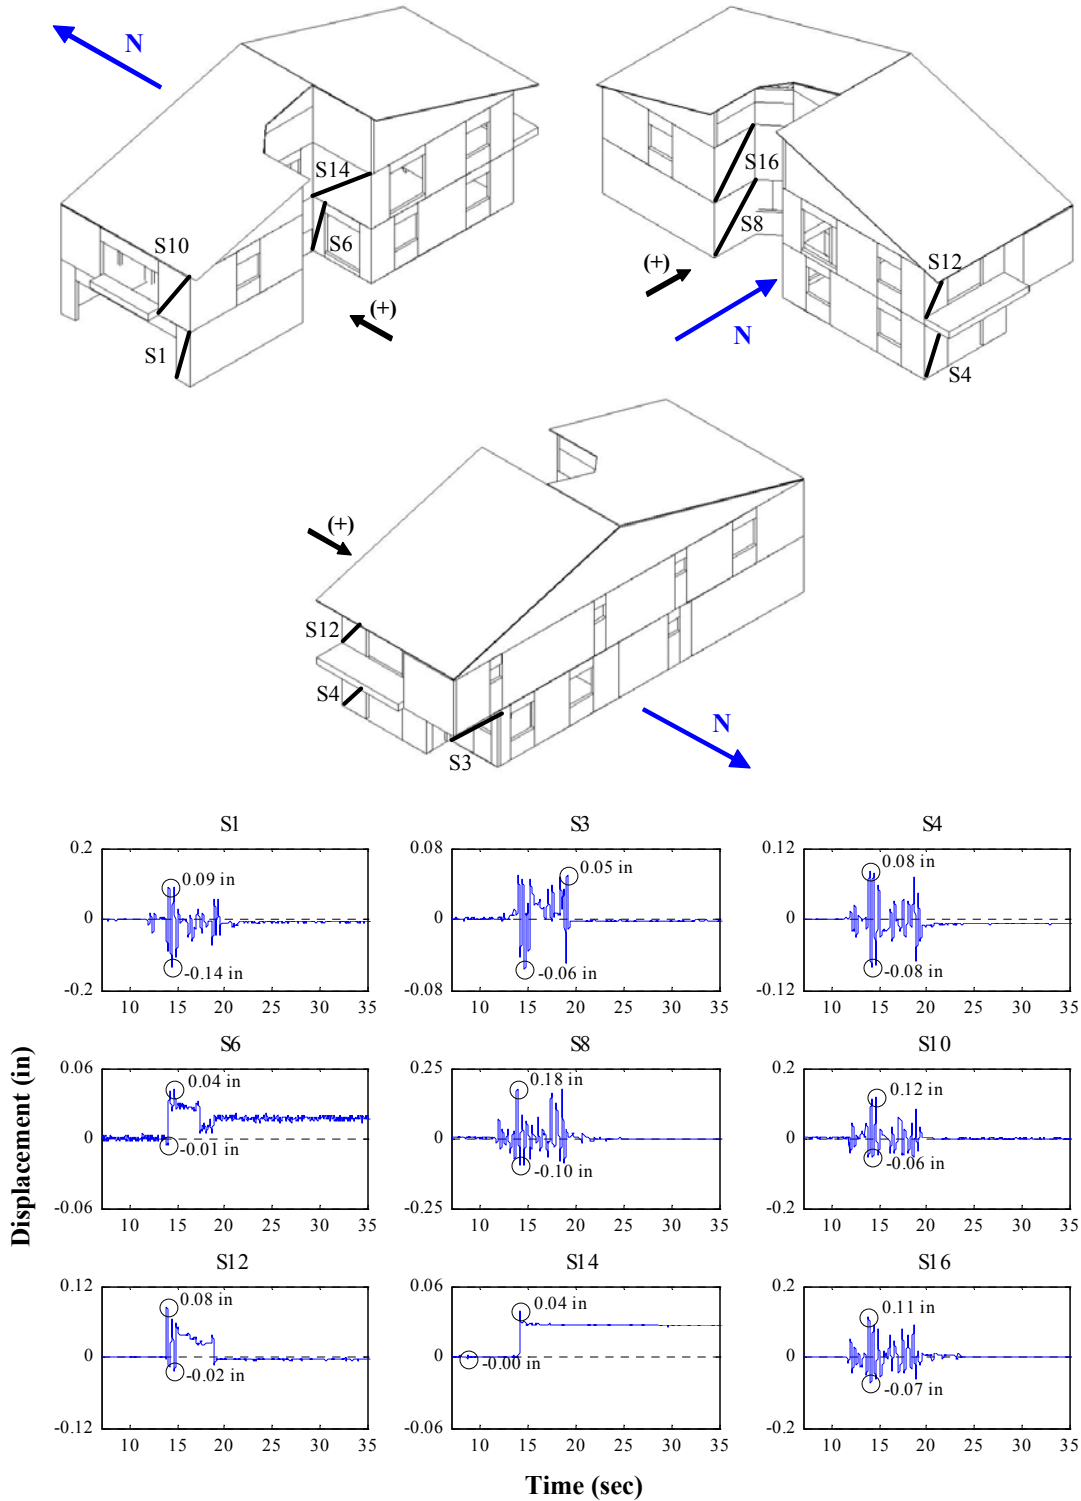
Wall deformations of north-south external walls for Test NWP2S29
